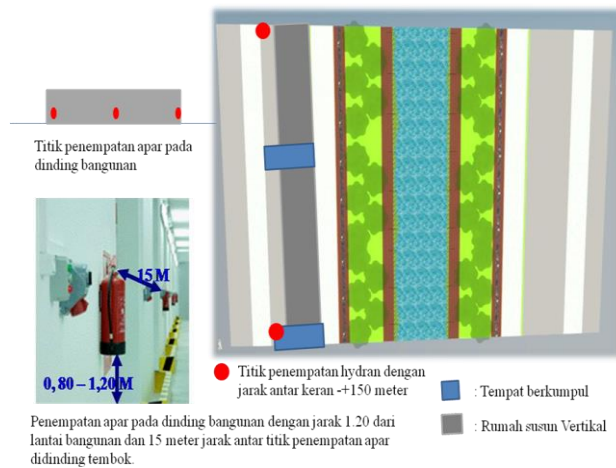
extinguishers and Hydrant placement point in Kp. Jembatan Beton Way Blau [11]
